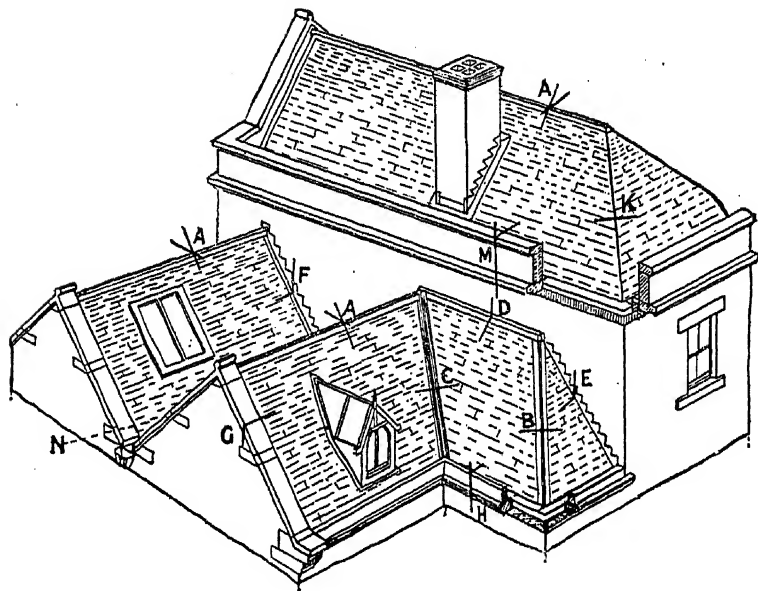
Reference Sketch illustrating Plumbers' Work on the Roof of a Building.
